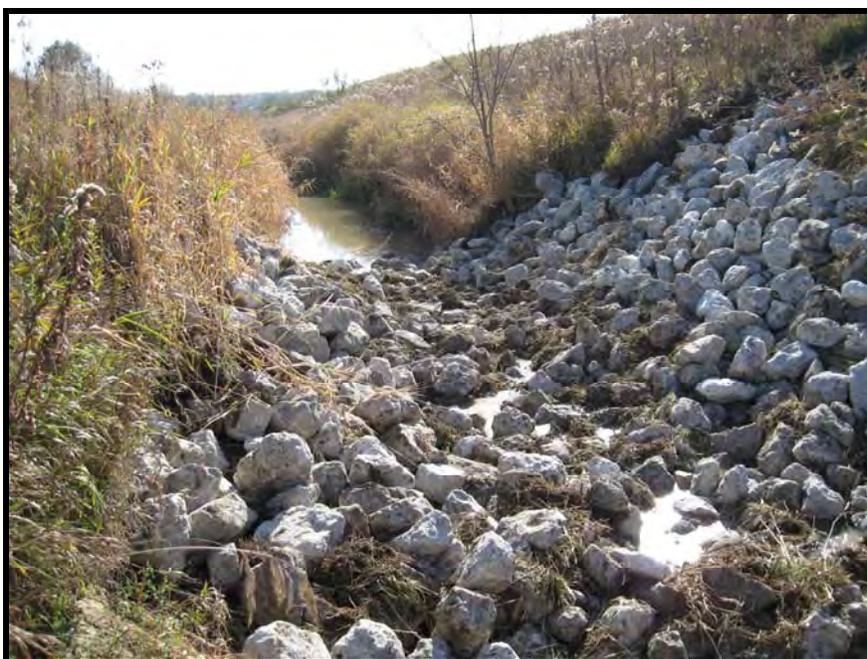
Grade control structure installed on November 2, 2008 on Rimmell ditch approximately 350 feet (106.7 m) upstream of C.R. 300 E crossing.
